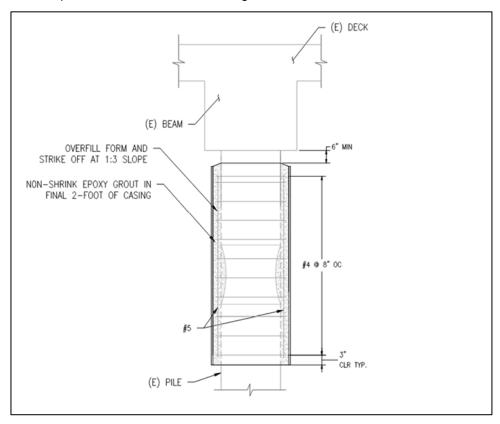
Pile Repair near Waterline – FRP Jackets
